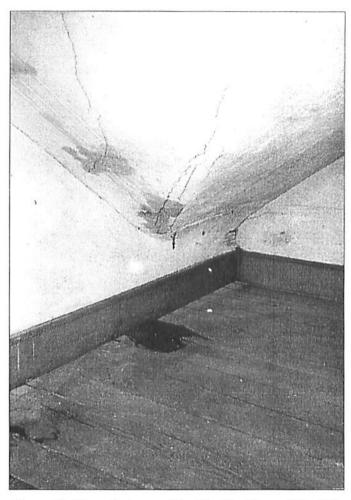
View of minor roof leak in attic. The roof should be examined above this leak and repaired.
